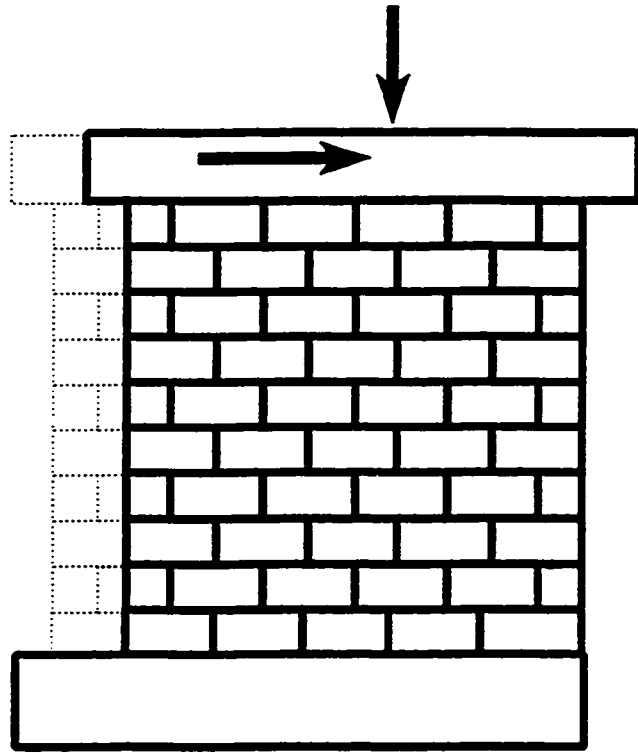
New External R/C Wall (NEHRP 1992)
